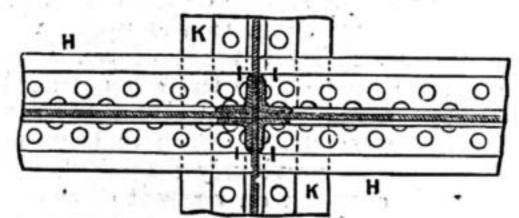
Connection of Longitudinal Girder with Cross Girder.
